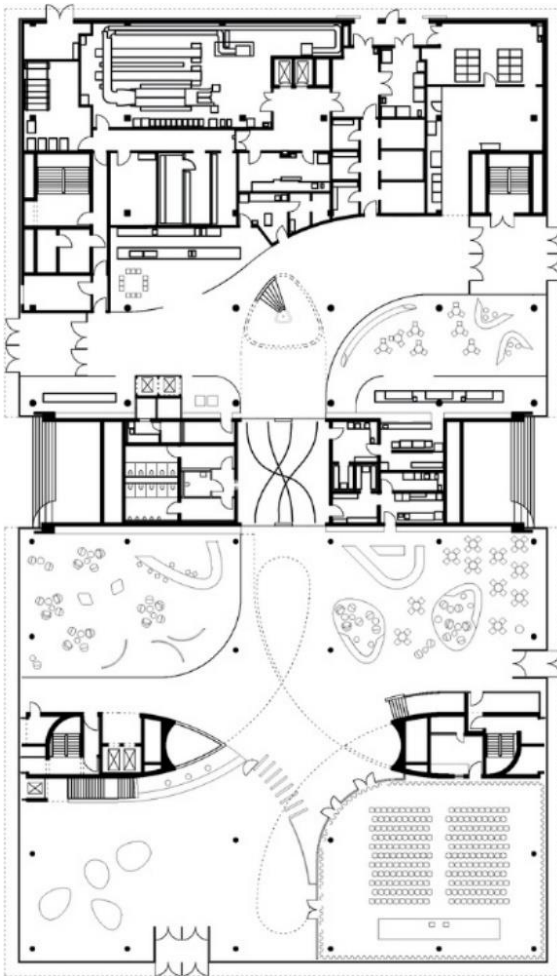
GROUND FLOOR PLAN (HENN, 2018)
